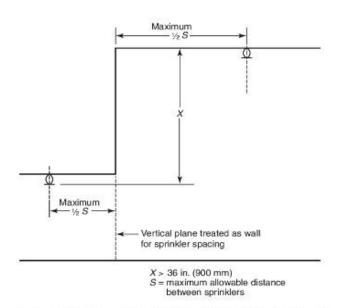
(A) Vertical Change in Ceiling Elevation Greater Than 36 in. (900 mm).
